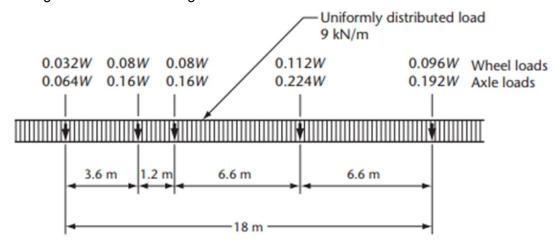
CL-W Lane Load loading details [3]
